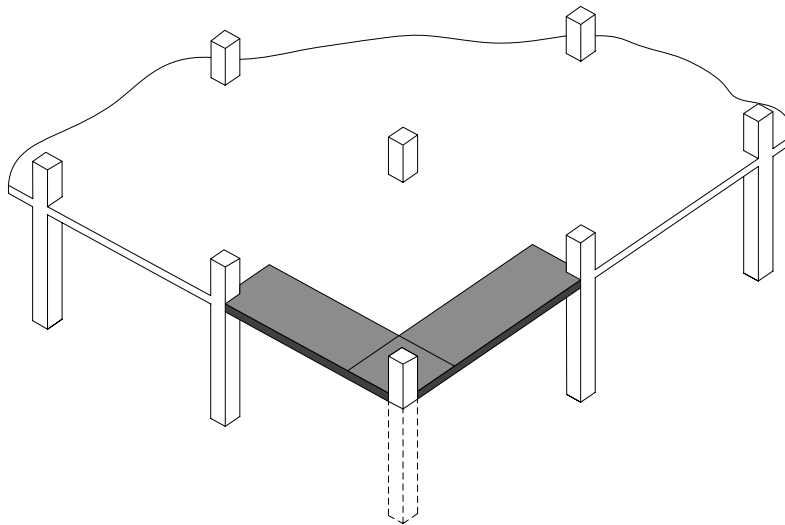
Improvement of the design of floor slabs in the corner column strip regions only, when corner column is removed (continuity of top reinforcement).
